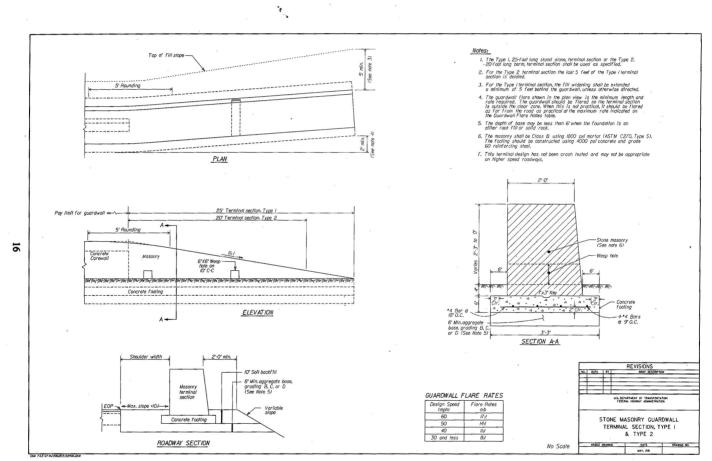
Stone Masonry Guardwall -- Terminal Details.
